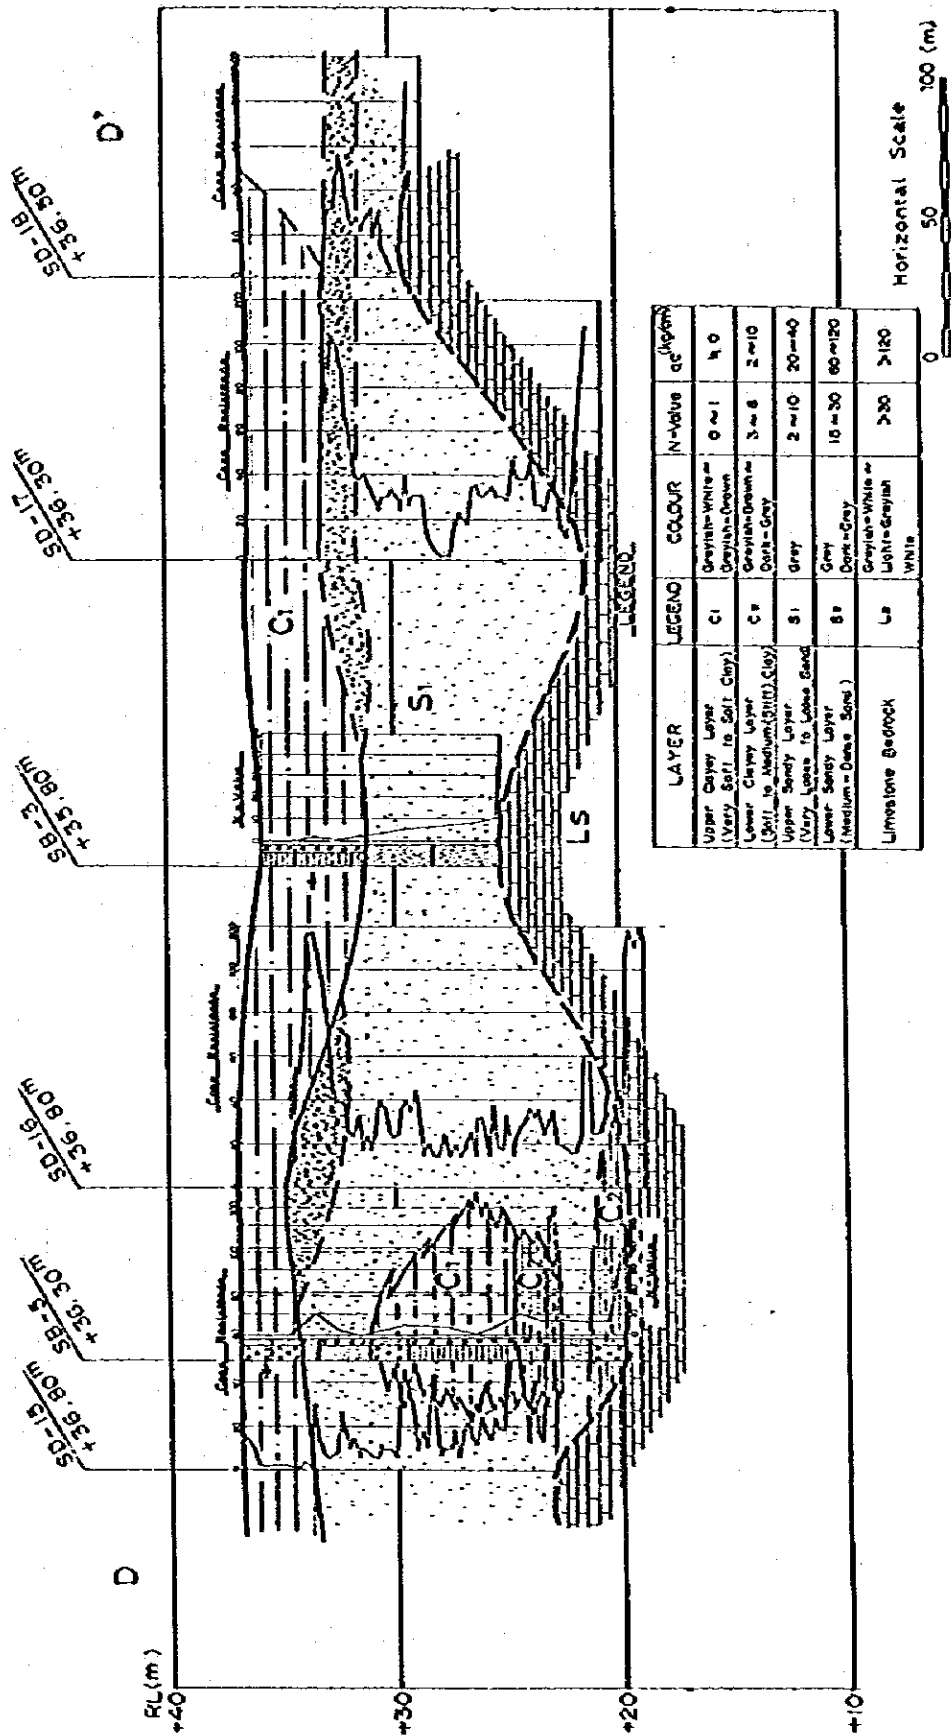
Soil Profile at Sentul, Cross Section D-D'
